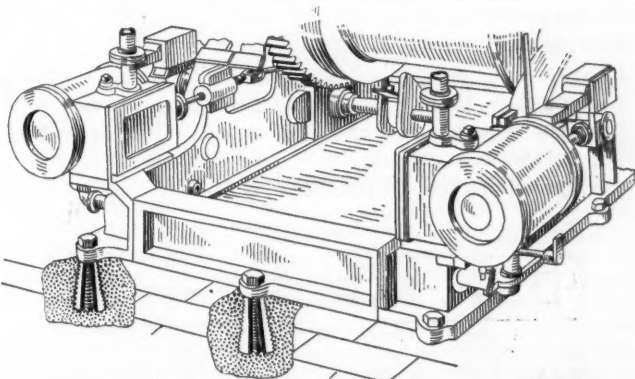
EXPANSION ANCHORS ON HOIST BED
